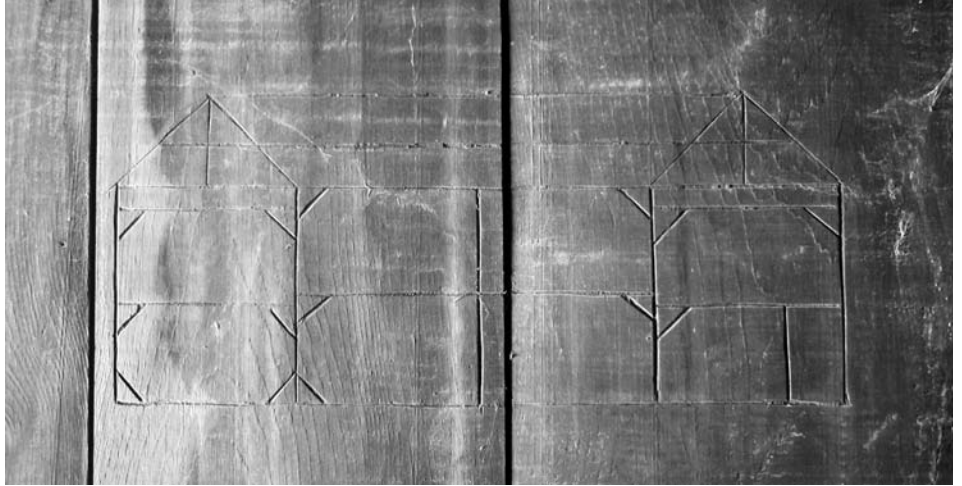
(left, top) – Detail of post in the Beems New World Dutch barn, in Brunswick, Rensselaer County, NY, showing drawing of anchor beam and braces (June 2010).
